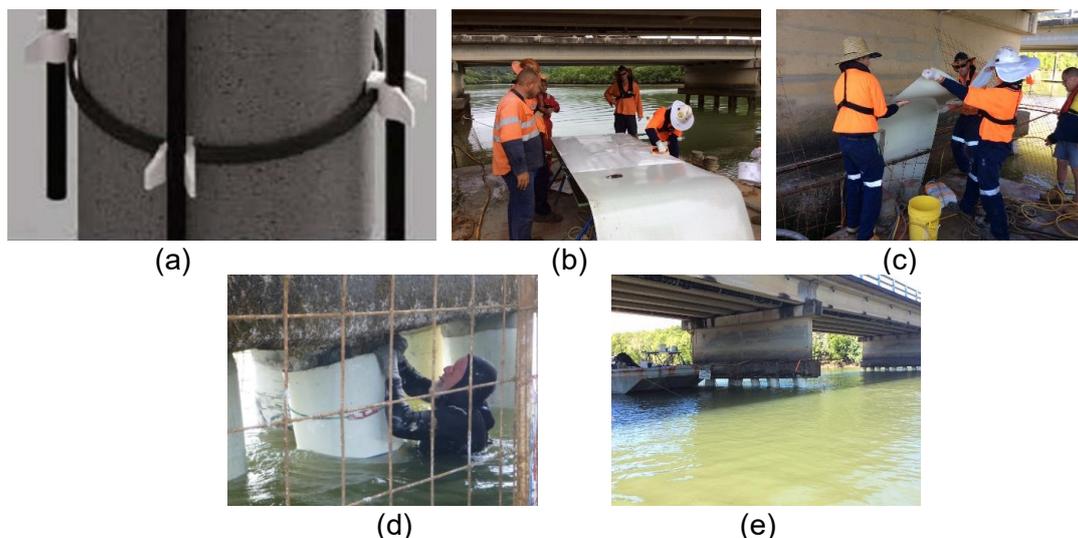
Repair of ASR-damaged piles in Australia: (a) spacers and reinforcing bars, (b) applying epoxy to PileMedic® laminate, (c) passing the laminate to the workers, (d) create a shell around the pile and (e) fill the annular space with grout.
